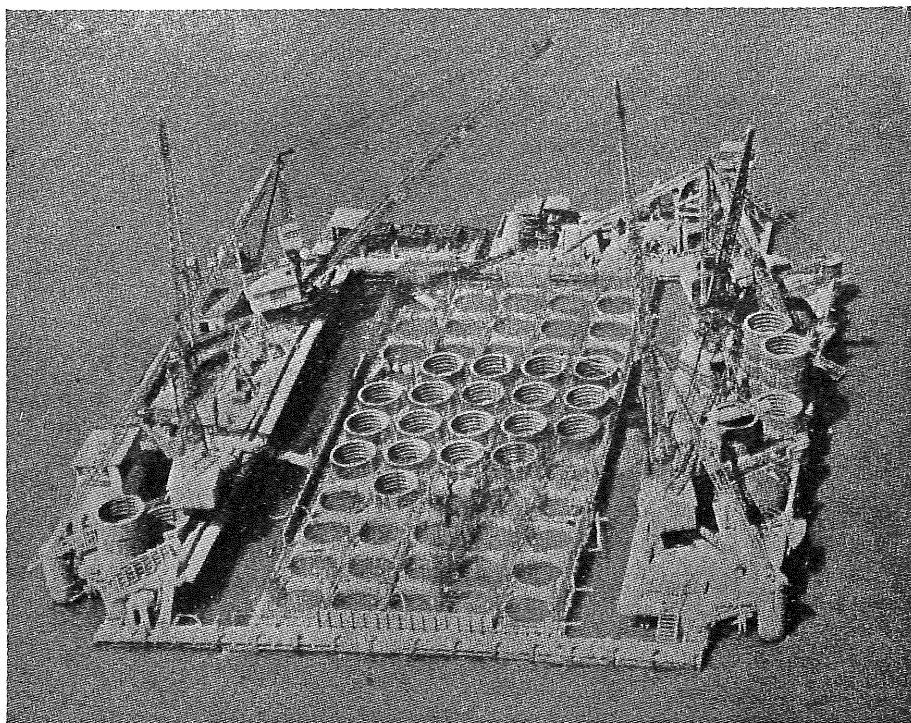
CAISSON FOR CENTRAL ANCHOR PIER, SAN FRANCISCO-OAKLAND BAY BRIDGE.
